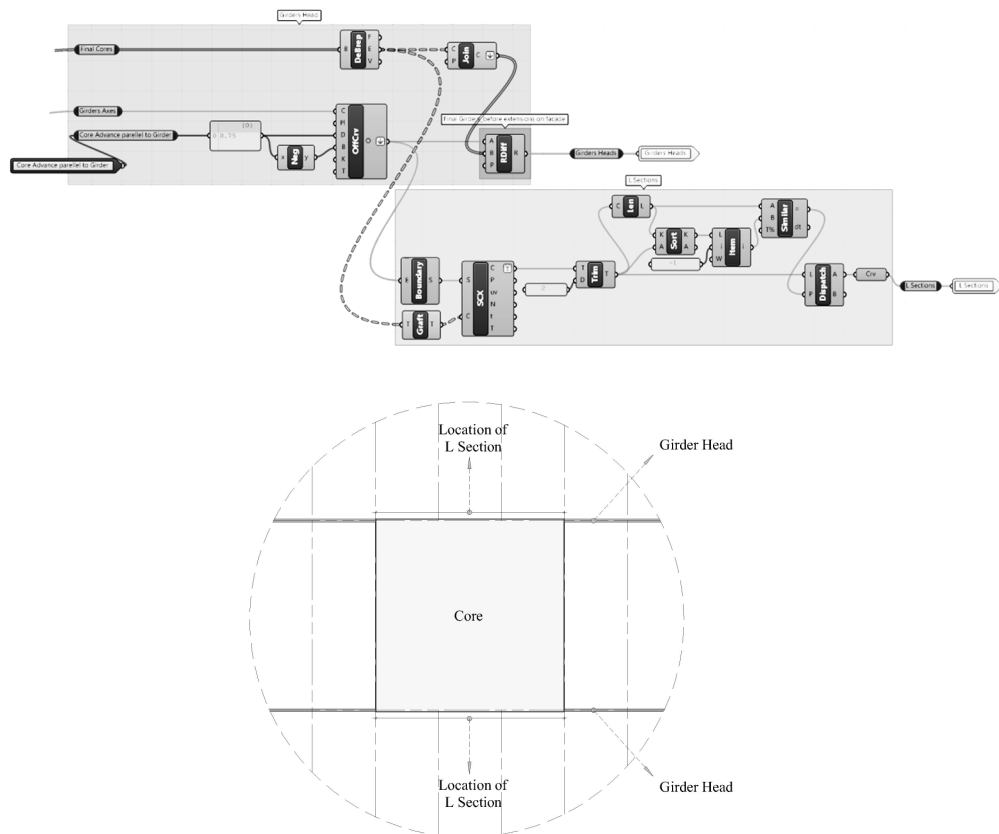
Placement of girders and L sections. Visual script and design solution (plan view)
